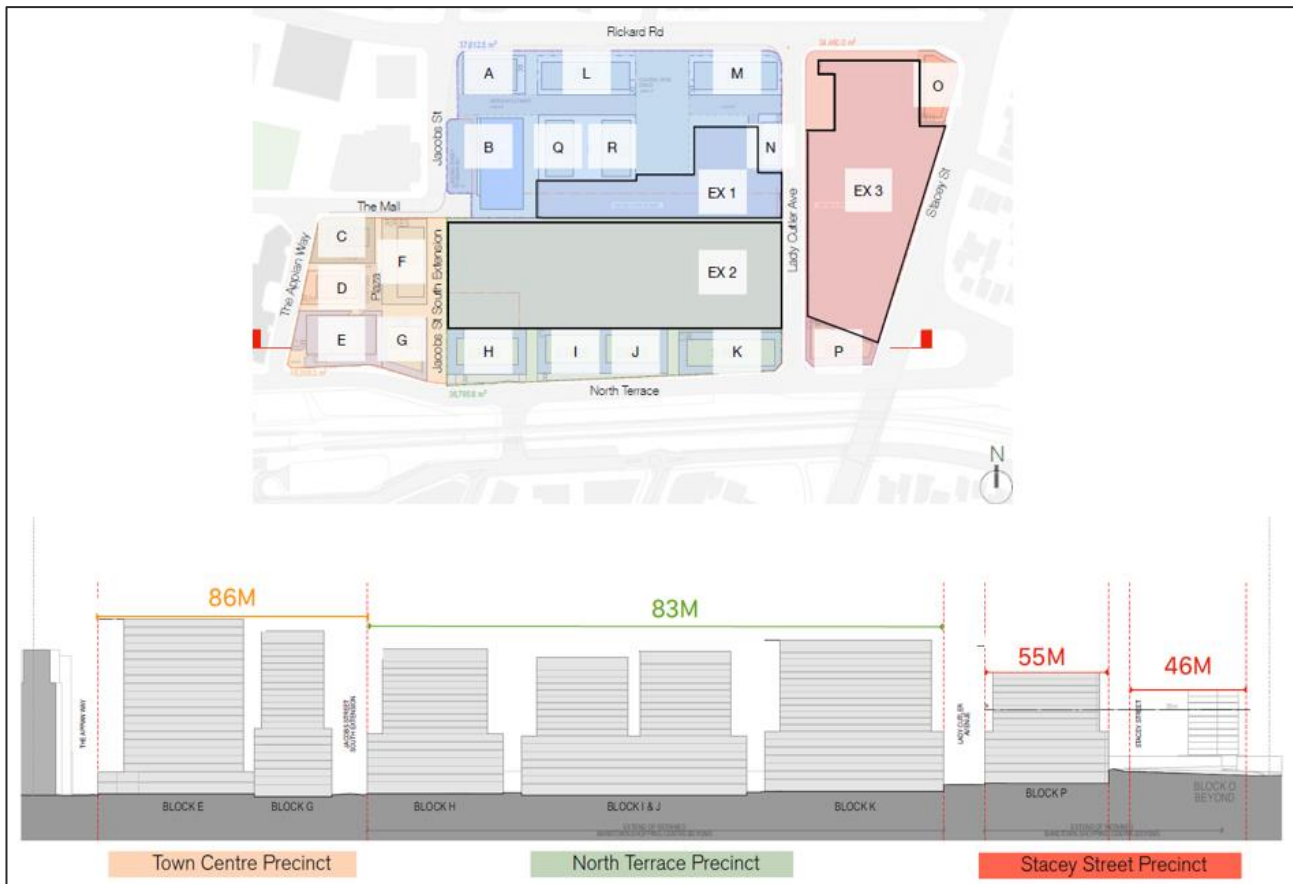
Proposed building height sections (Source: Planning Proposal, 2022)
